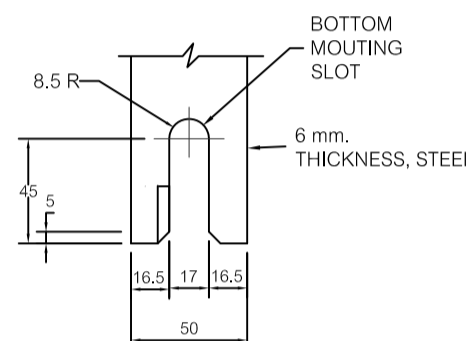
DETAIL - "H" UNDERGROUND CABLE SUPPORT
